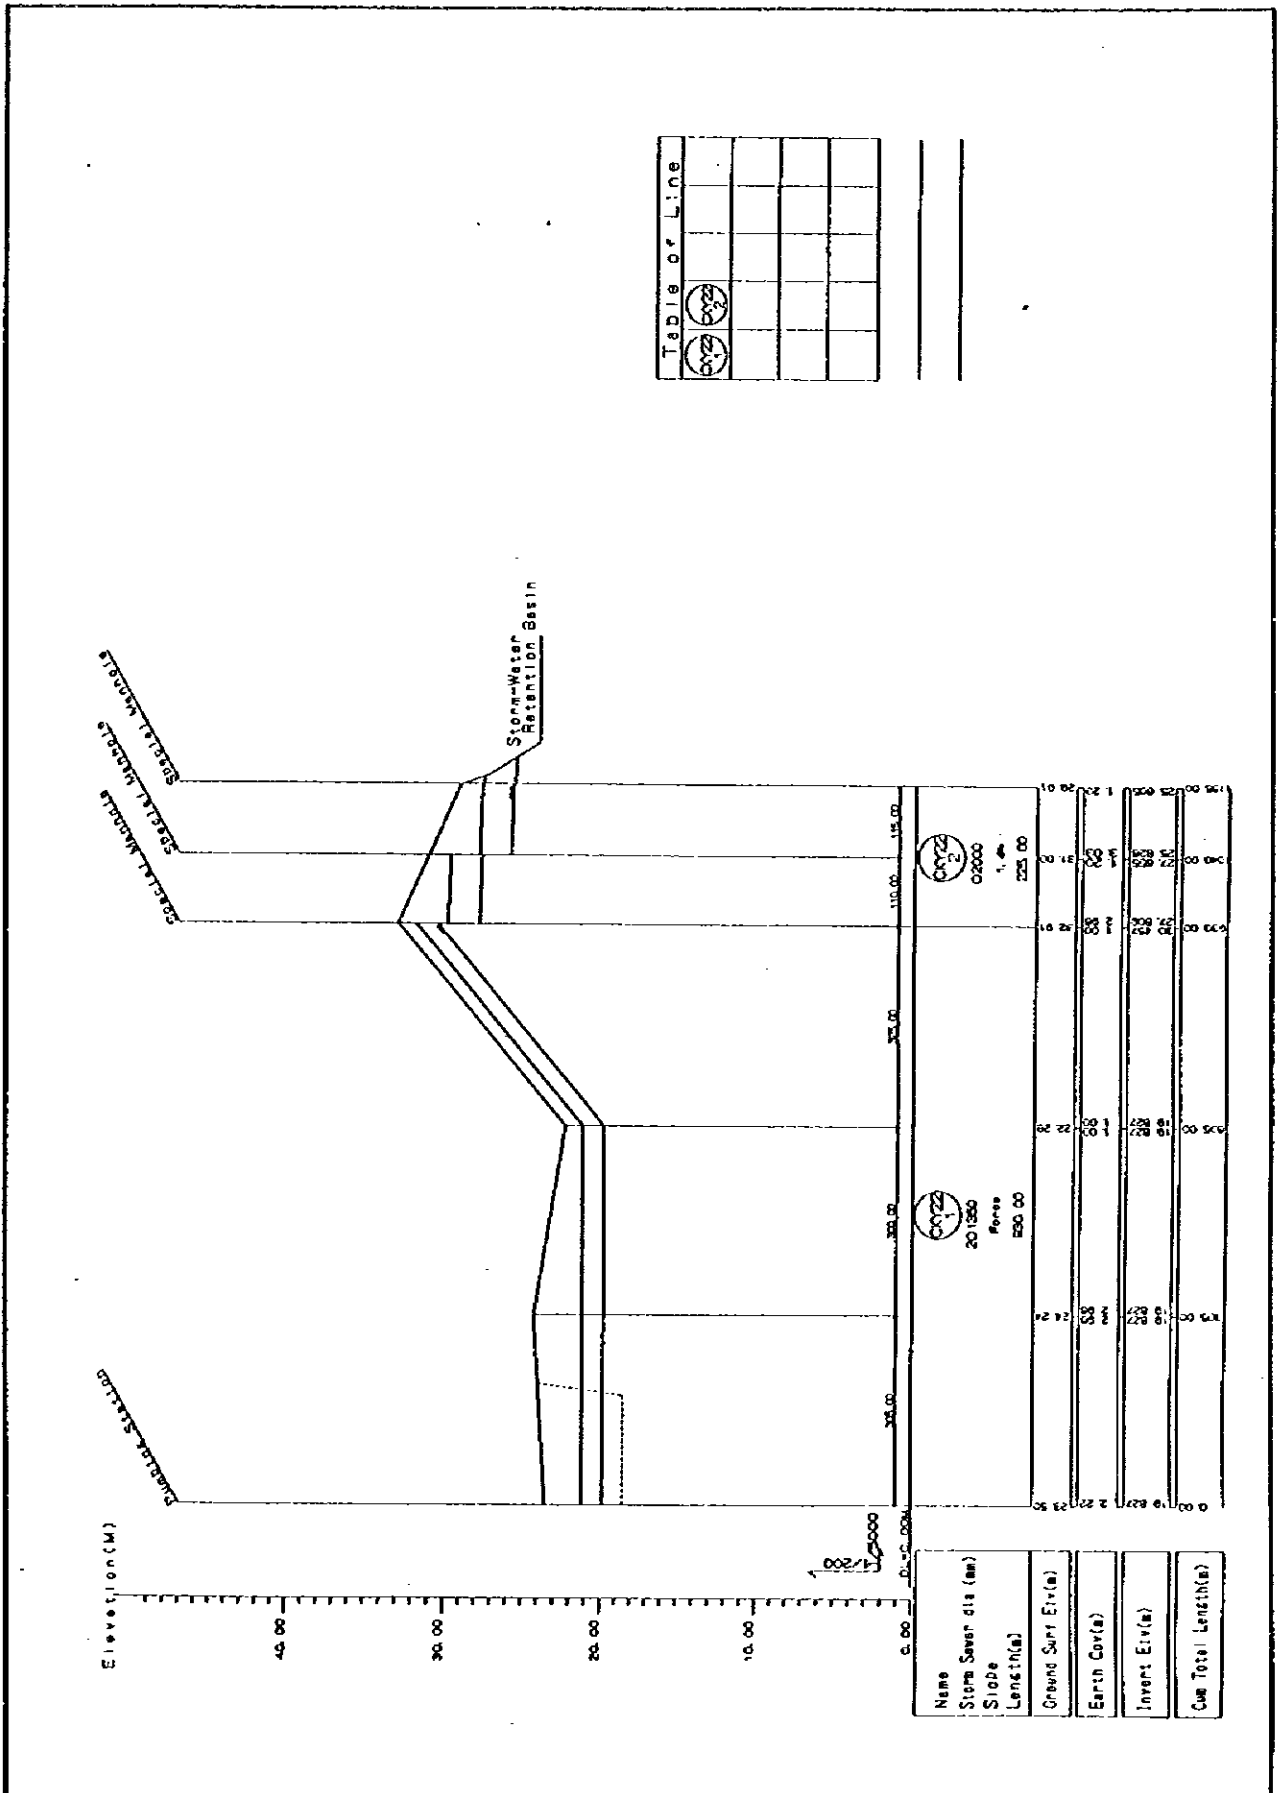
PROFILE OF DRAINAGE CONDUIT (2)
